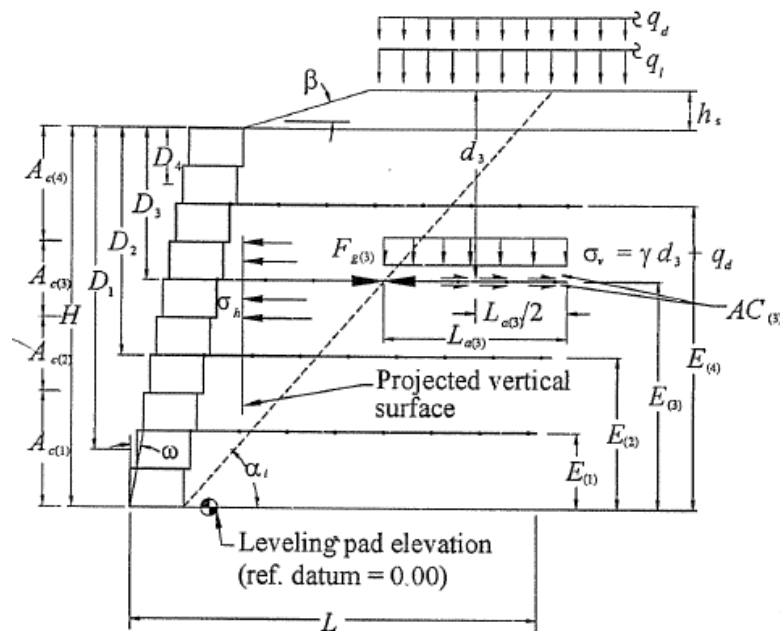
Typical Section of SRW (after NCMA Design Manual)
